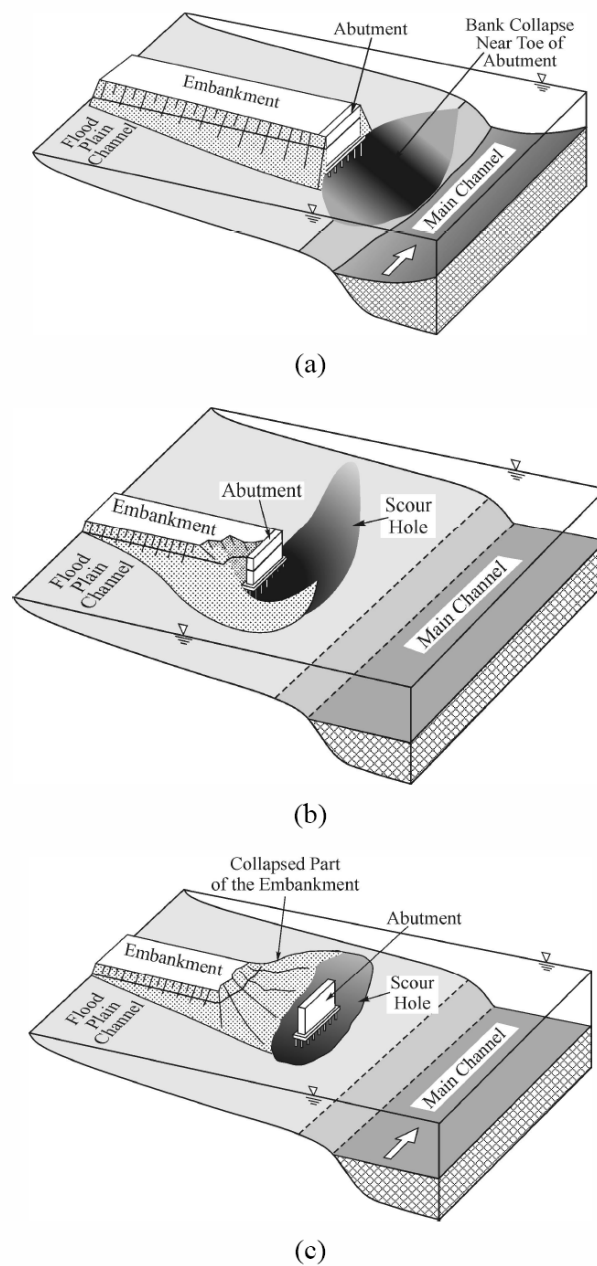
Abutment-scour conditions: Scour Condition A - hydraulic scour of the main channel bed causes bank failure, which causes a failure of the face of the abutment embankment (a); Scour Condition B - hydraulic scour of the floodplain causes failure of the face of the abutment embankment (b); and, Scour Condition C - breaching of the approach embankment exposes the abutment column so that scour progresses as if the abutment were a form of pier (c) (Ettema et al. 2010).
